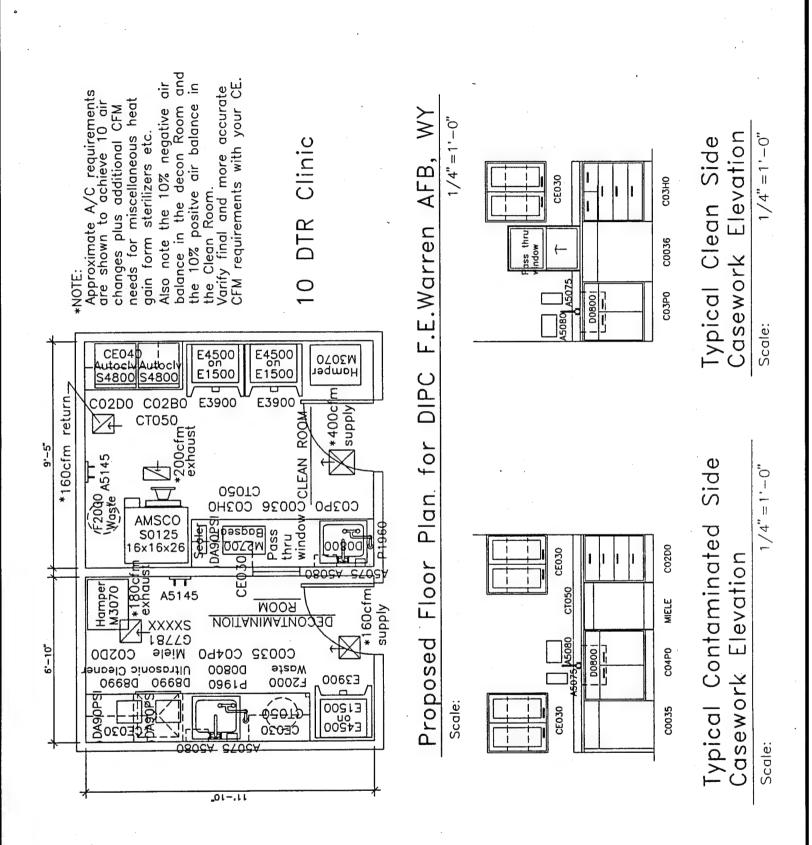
Medium Dental Instrument Processing Center Floor Plan
